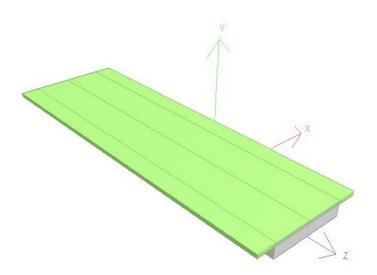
Fig. G Composite Multi-Cell Box-Girder Bridge [2c-20] (Top View)
